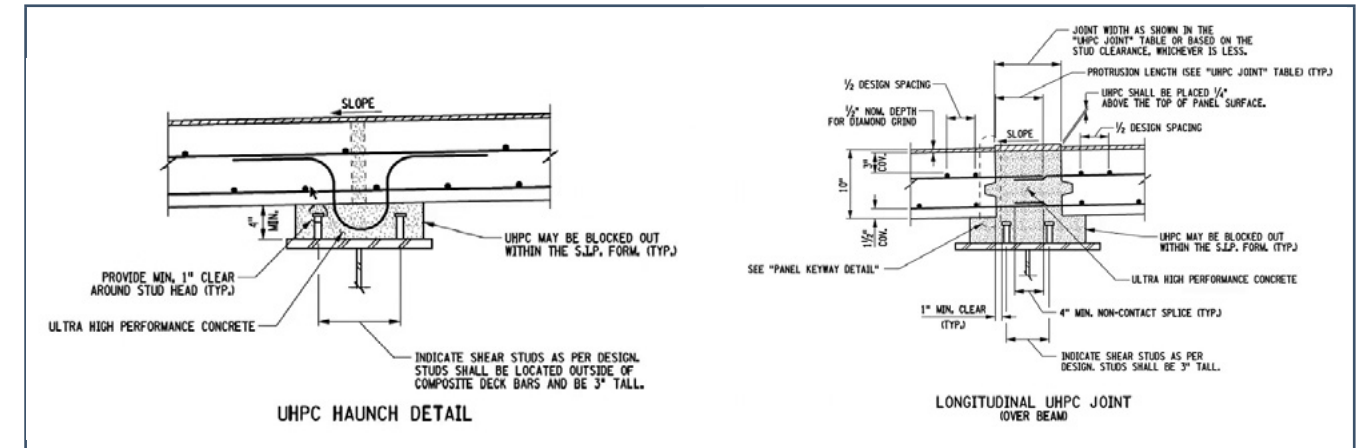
Full depth precast concrete panel shear stud pocked (left) and longitudinal panel-to-panel joint (right) detail from New York State DOT
